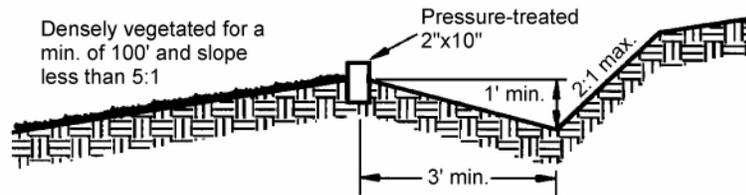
Detail Drawings of Stormwater Filtration Swale and Infiltration Trench
